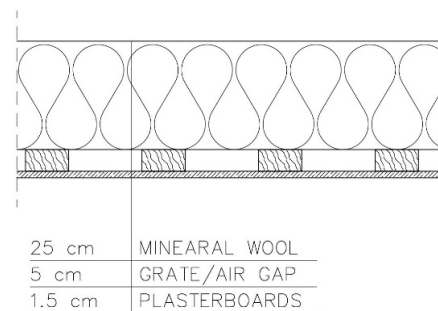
Variant 4: no PE foil in the arrangement of layers. Roof ventilation equal to 20 changes per hour.
